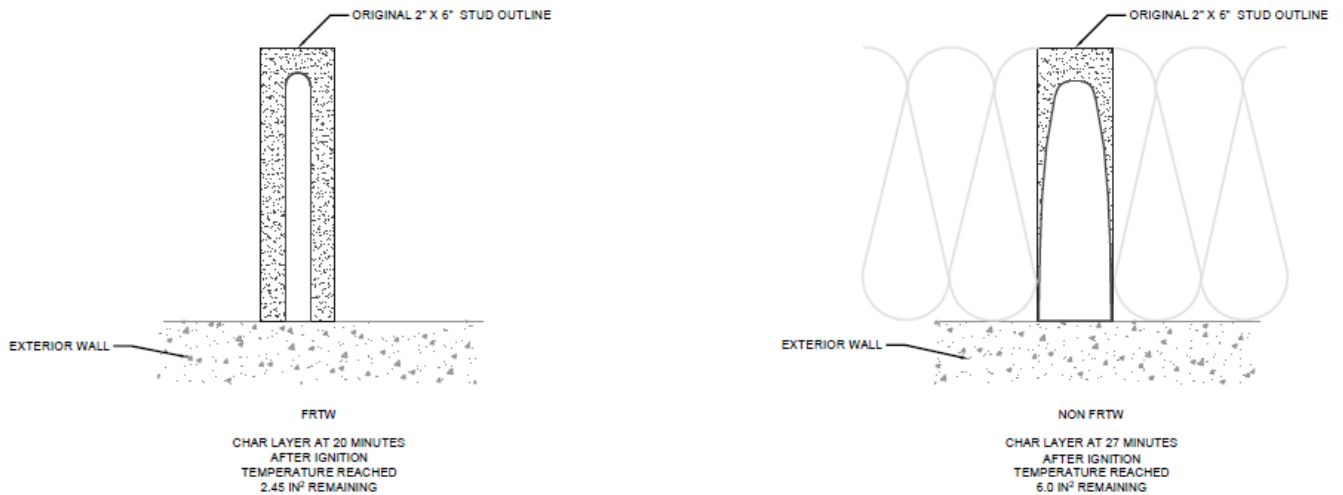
FRTW and Non-FRTW Stud Walls at 70 Minutes After Fire Exposure of Gypsum Board Wall
